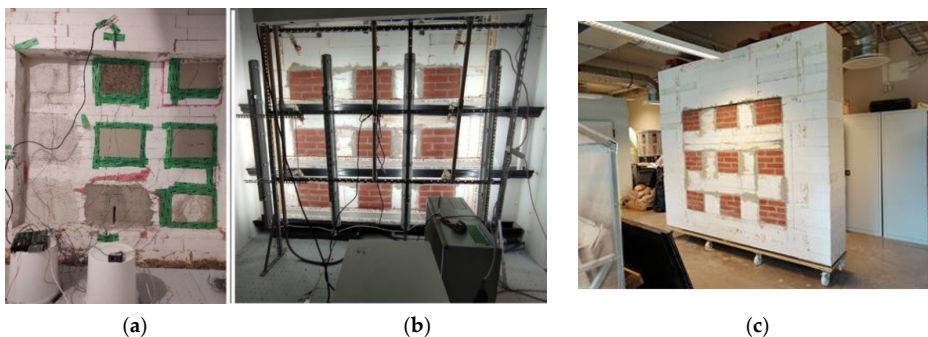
Test wall constructed for the laboratory experiment: (a) test wall from the hot-box side; (b) test wall from the cold box side; (c) test wall before insertion between hot-box and cold-box.
